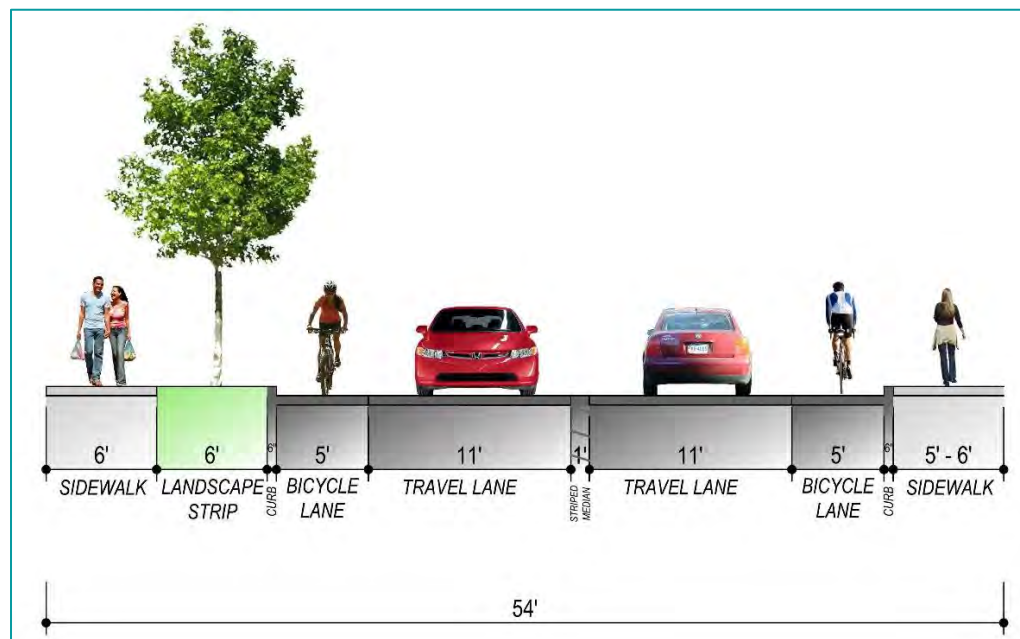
Preferred Alternative: Section D – E. High Street between 9 ½ Street and CFA Institute Entrance
